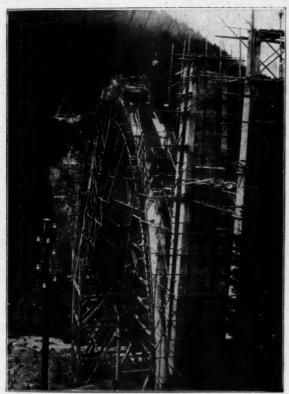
Details of Central Tower, Showing Reinforced Concrete and Timber Framing.
